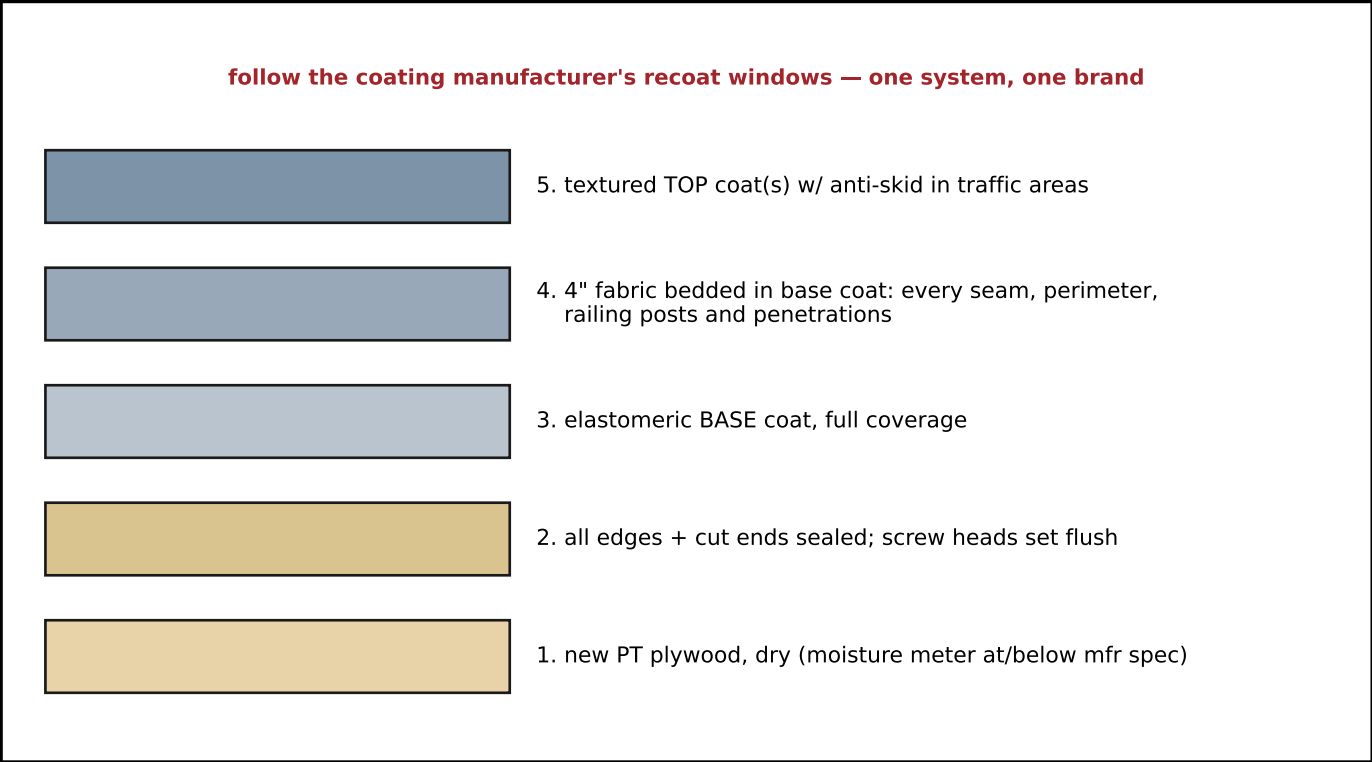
UPSTAIRS FLOOR SECTION AT SEAM
